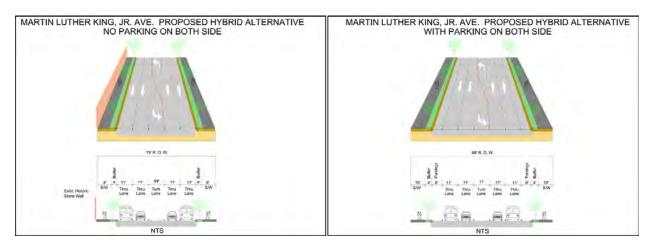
Proposed Typical Cross Sections on Martin Luther King Jr. Avenue SE in 2012 EIS
